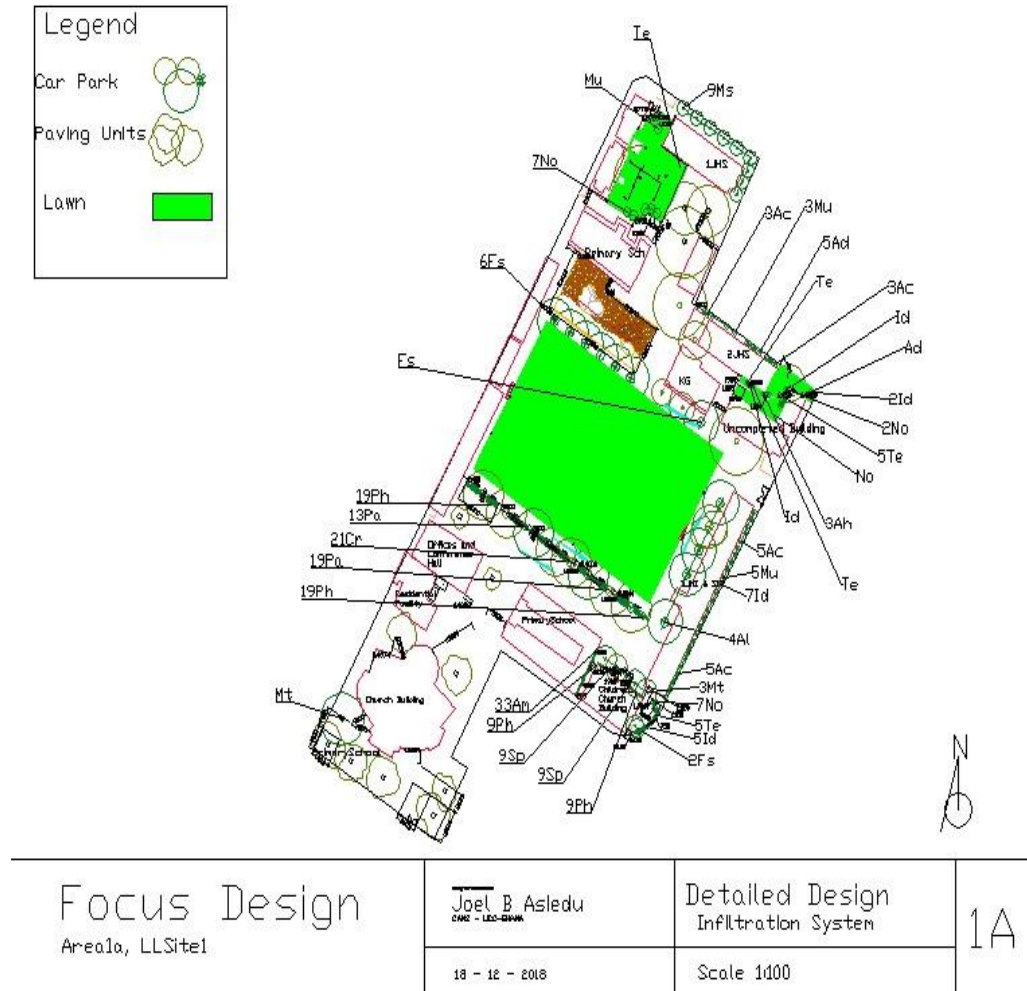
4: Detailed Design LLSite1 – Planting Plan
